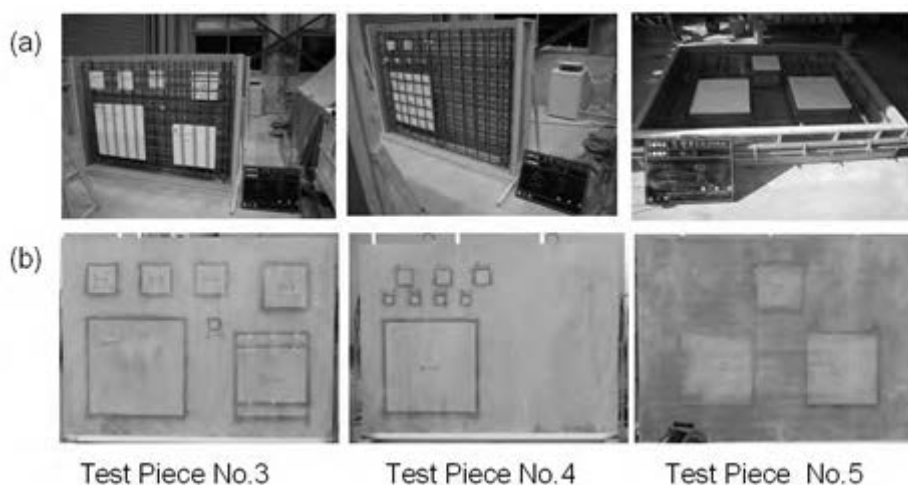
Examples of the concrete test pieces (No.3-No.5).
